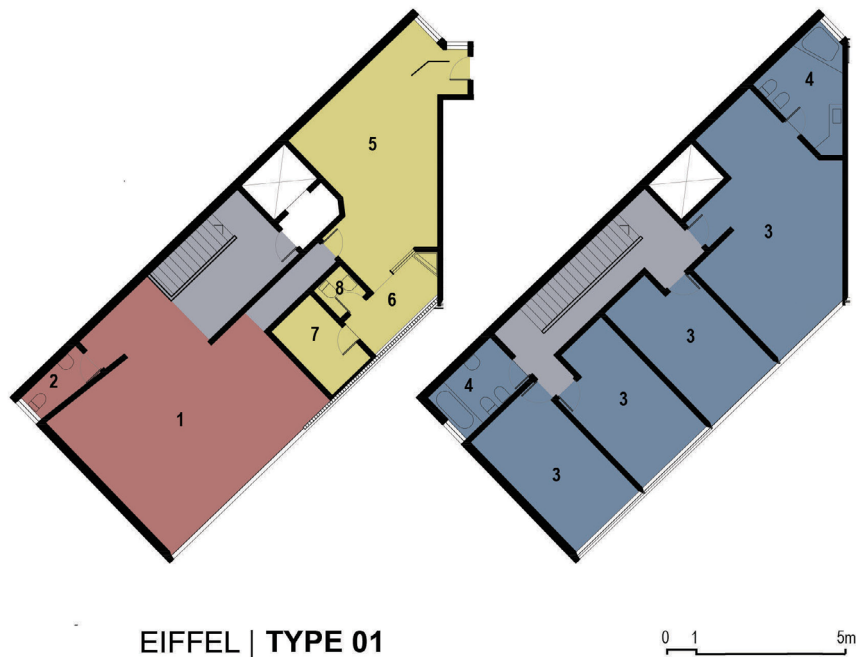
Eiffel Building – type 1 apartment (1951-53).
